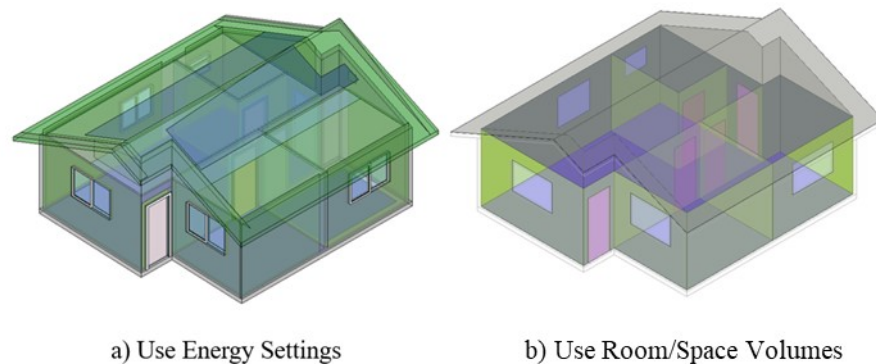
shows the modeling results for the single-family building using Autodesk Revit for the perspective views and floor plan.
